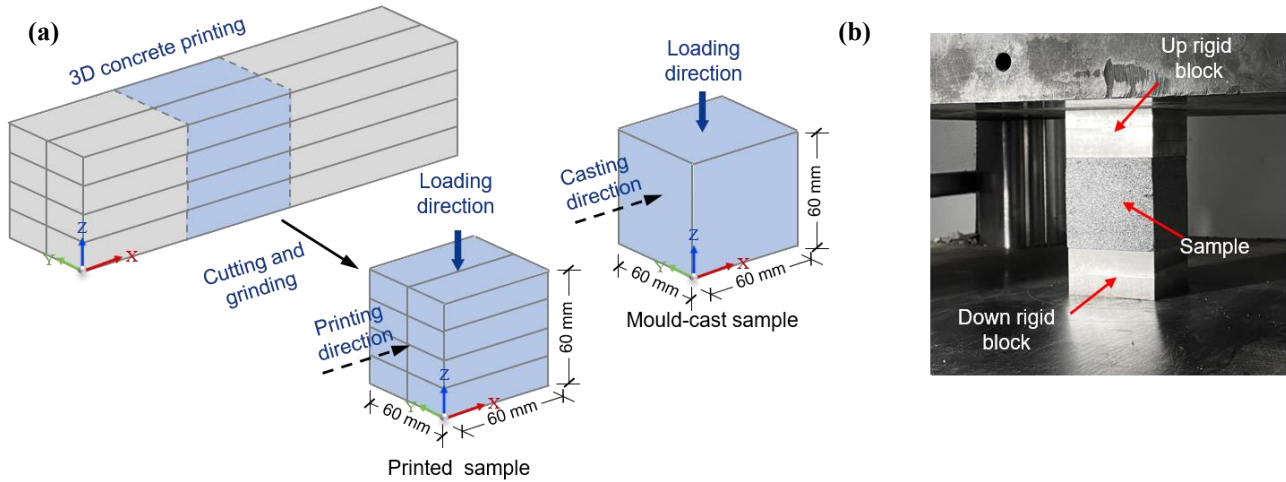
Schematic diagram of compressive tests on normal and printed ECC specimens (a) casting and printing, and (b) test set up.
